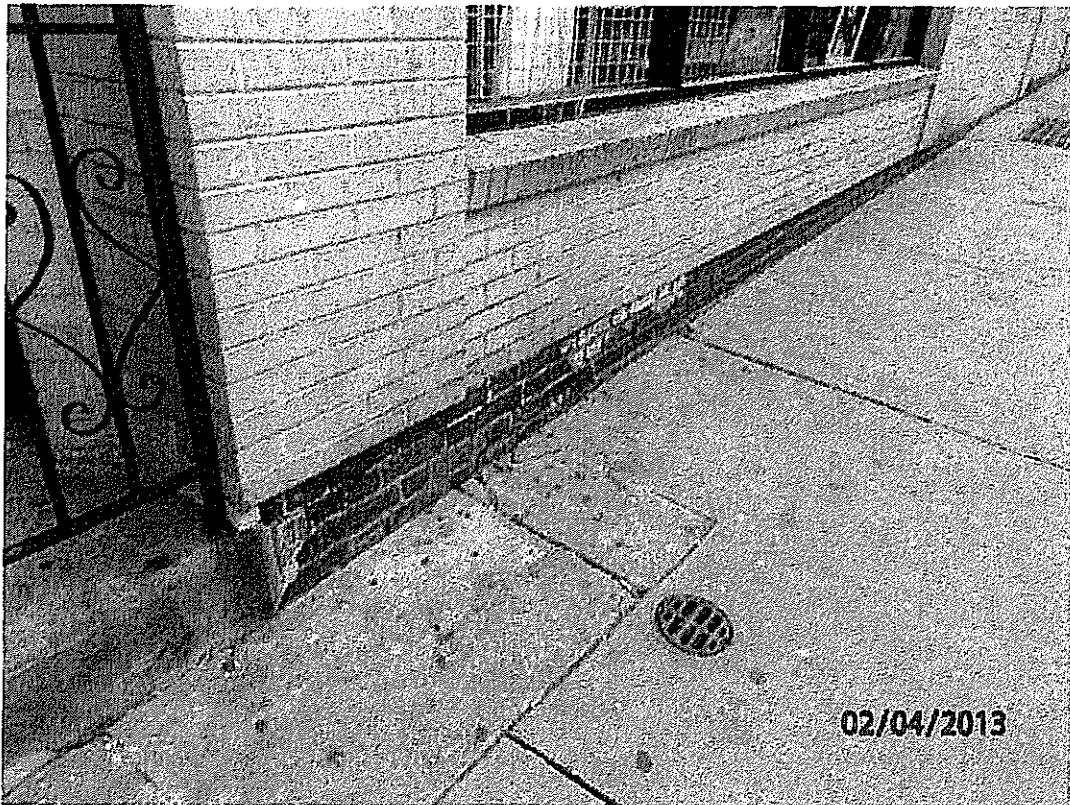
Façade Detail 2140 Market Street, Philadelphia, PA
